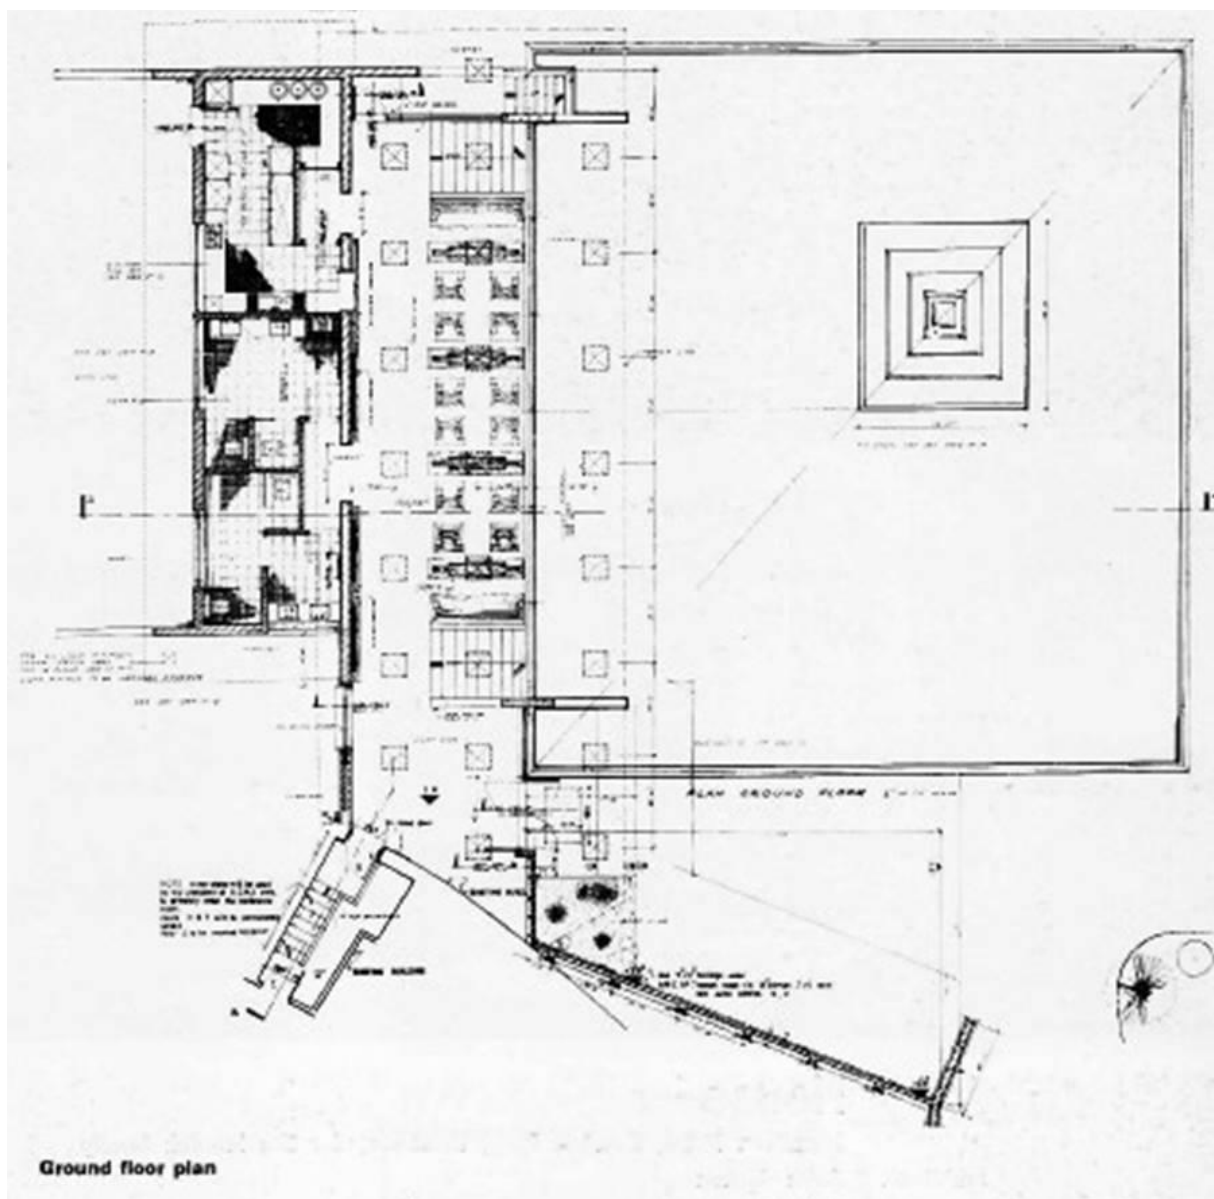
Original ground floor plans (from *Architecture in Australia*, 1968:1109)
